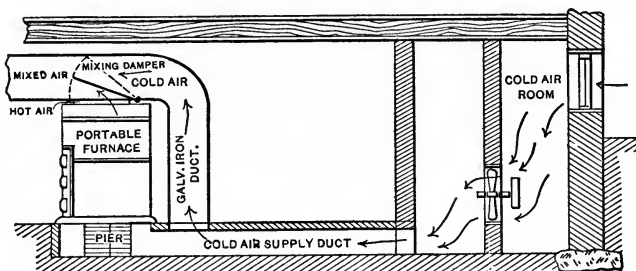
Sectional Elevation of Fan-Furnace Combination.
